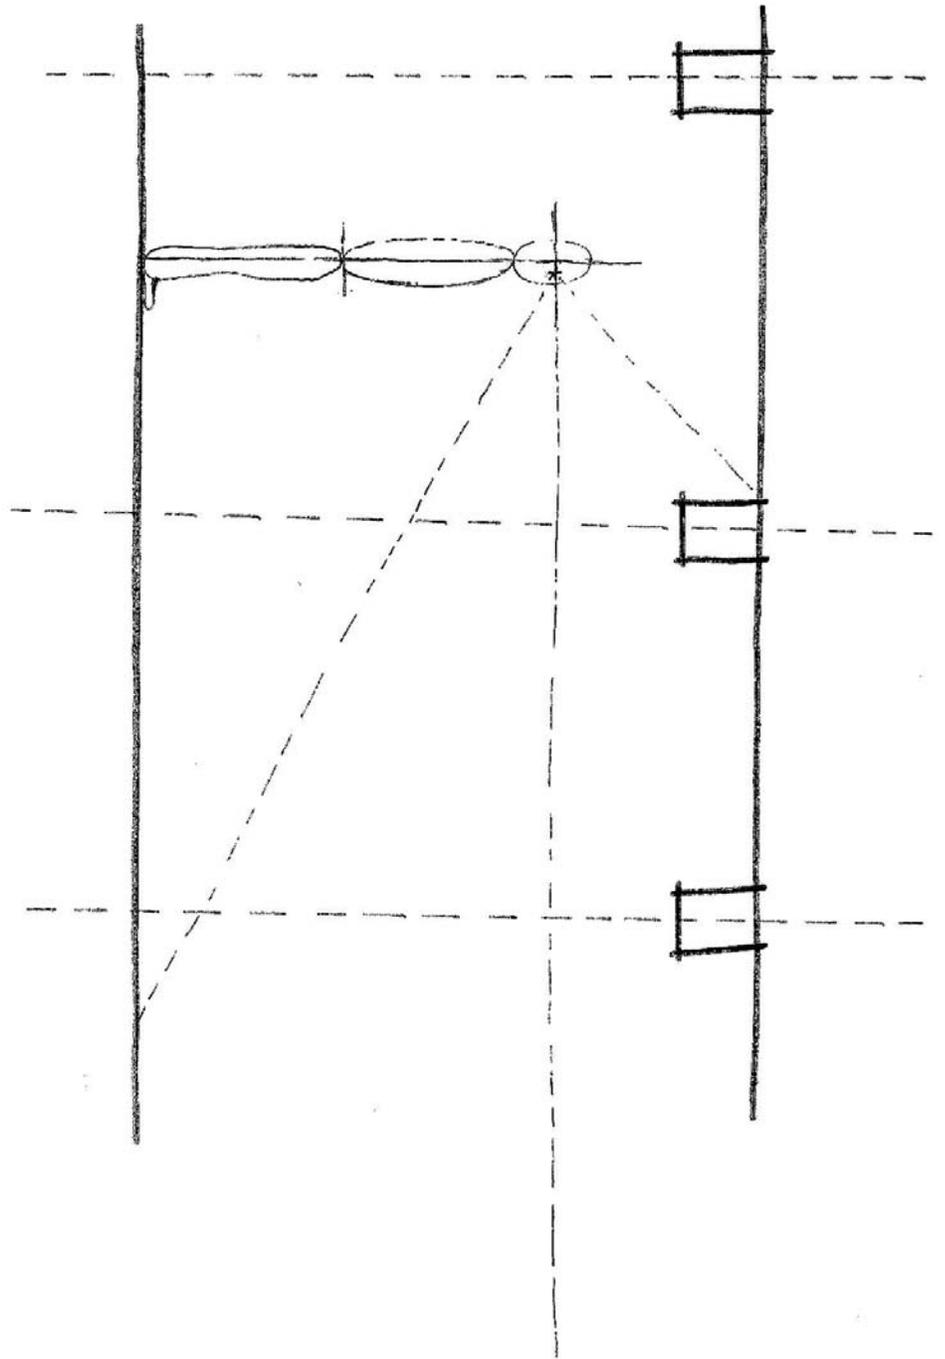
(Faulkner) Visual Diagram Sketch, Floor and Ceiling Relationship
